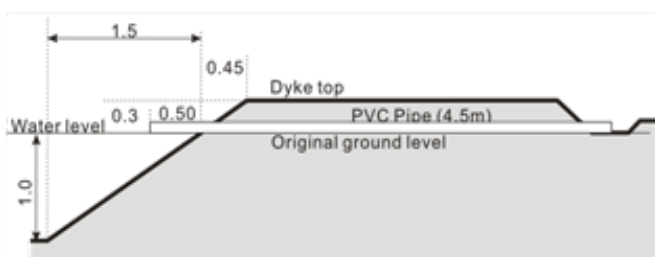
Positioning inlet and outlet pipes Fig 3.34 Standard Inlet Structure for fishpond with 100 mm PVC pipe
